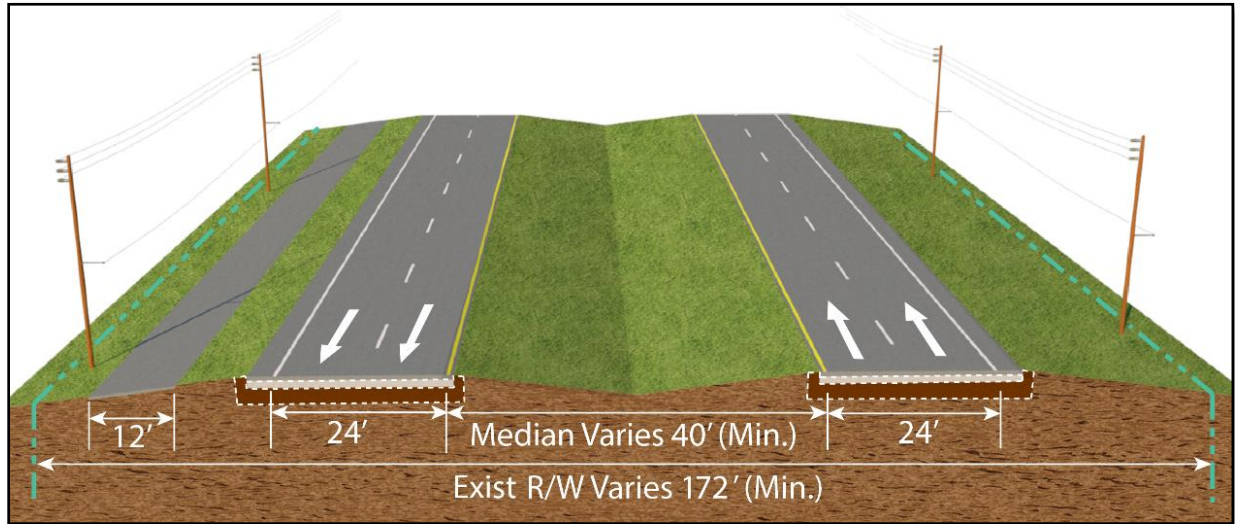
Existing Roadway Typical Section – Segment 1 – 4th St. N. to west end of Gandy bridges
